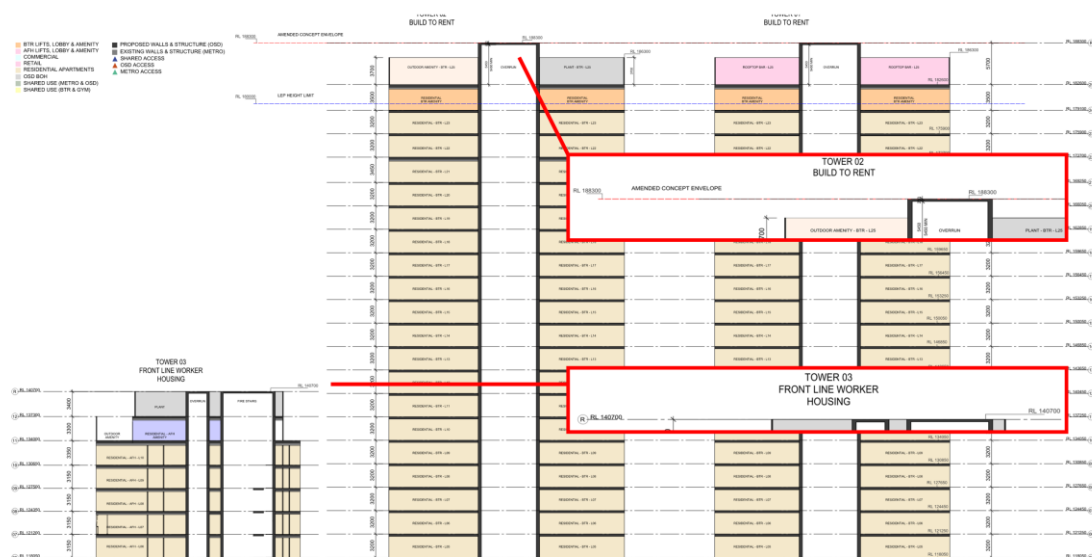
Long Section Exert showing height of buildings (Source: Woods Bagot)
